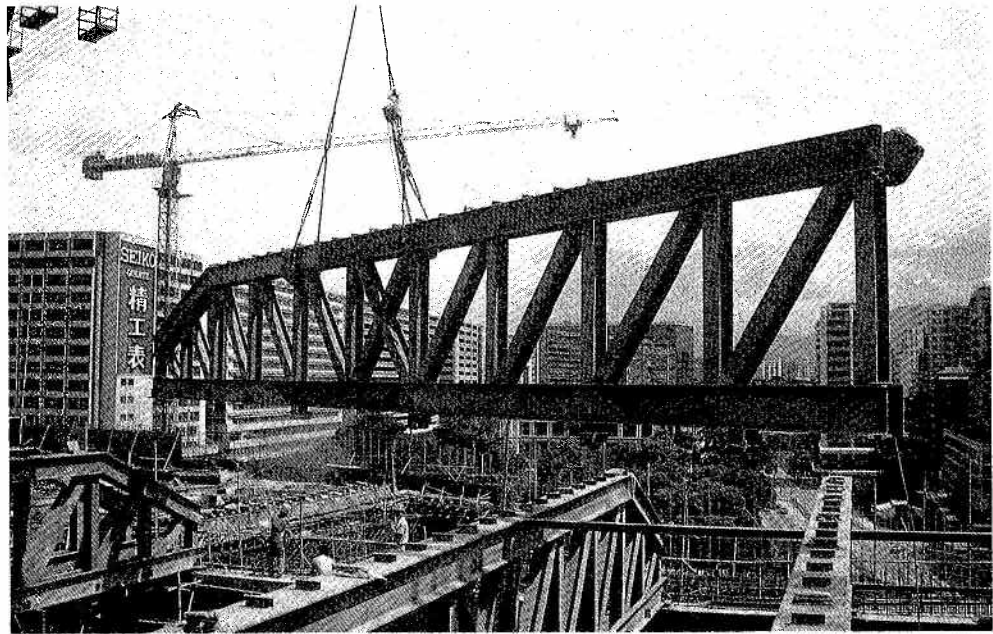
Manoeuvring of roof trusses of fly tower during construction
